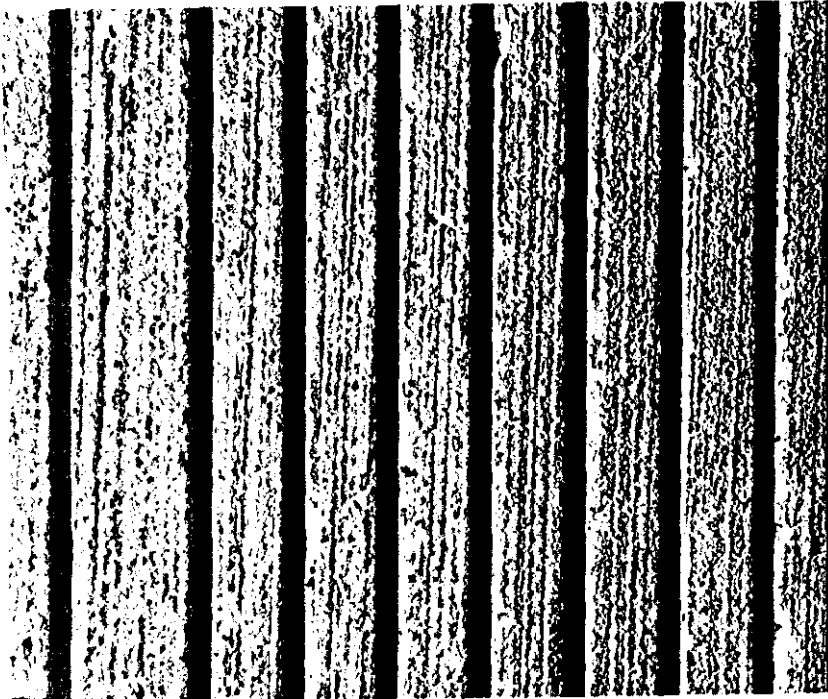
SAWED GROOVES IN PORTLAND CEMENT CONCRETE PAVEMENT
